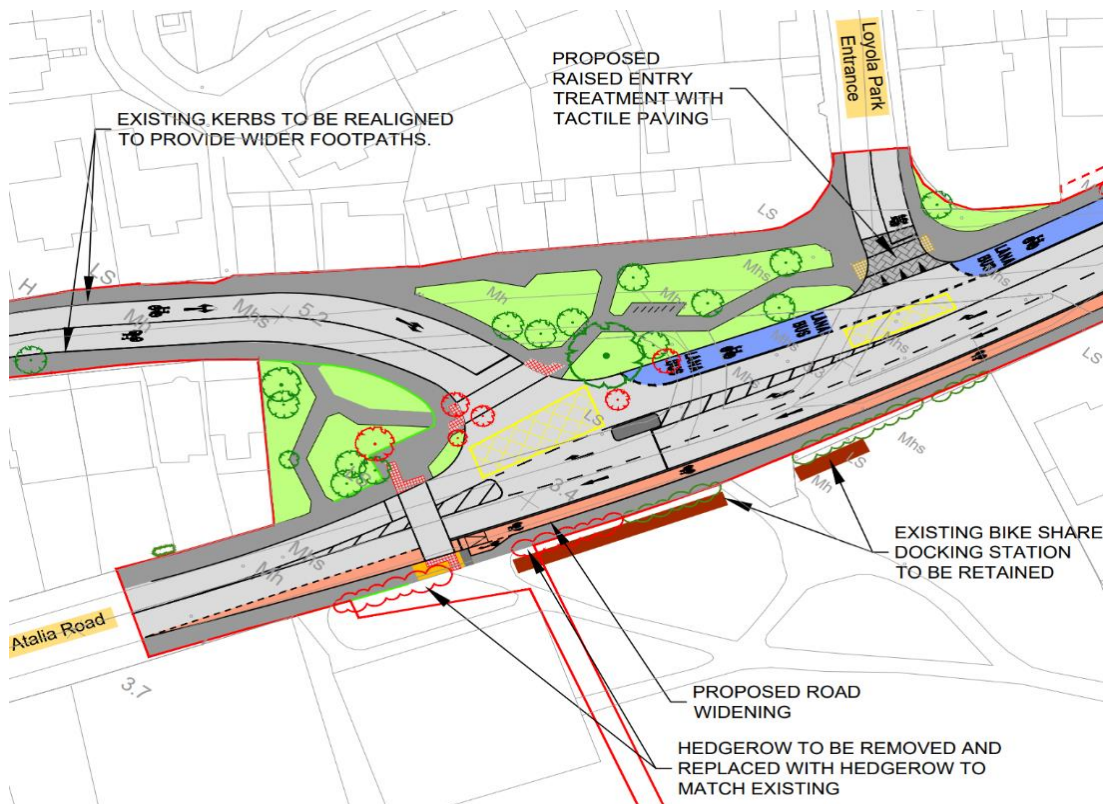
General Arrangement of Proposed Scheme at College Road / Lough Atalia Road Junction
